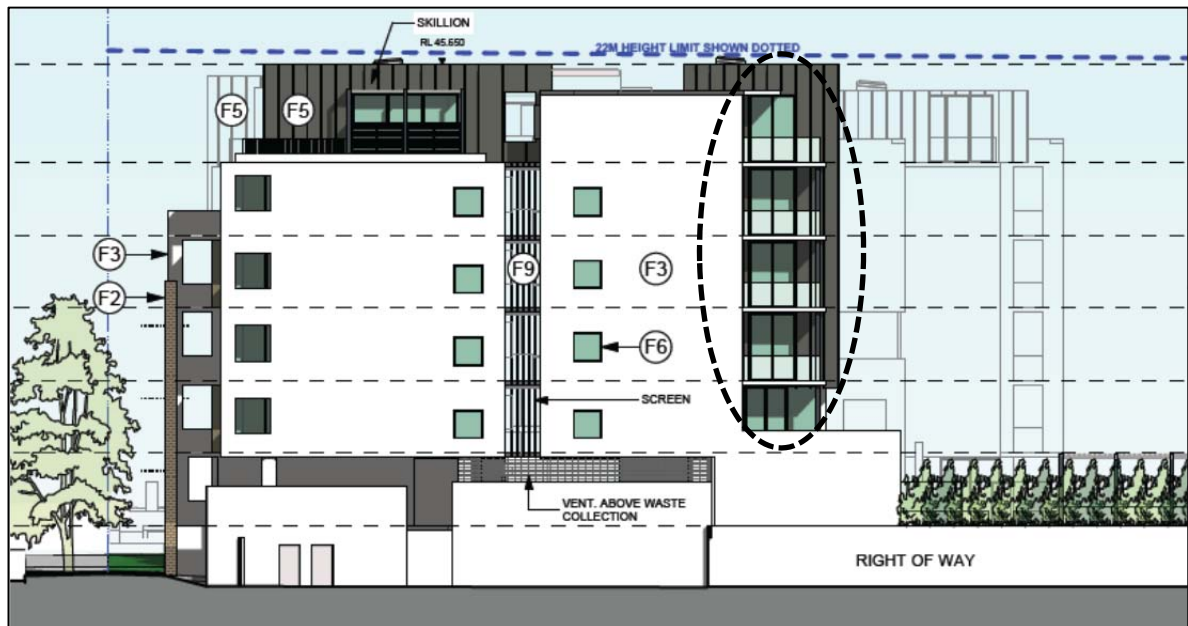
Existing balustrade and balcony treatment of the apartment in the southeastern corner of the development.
